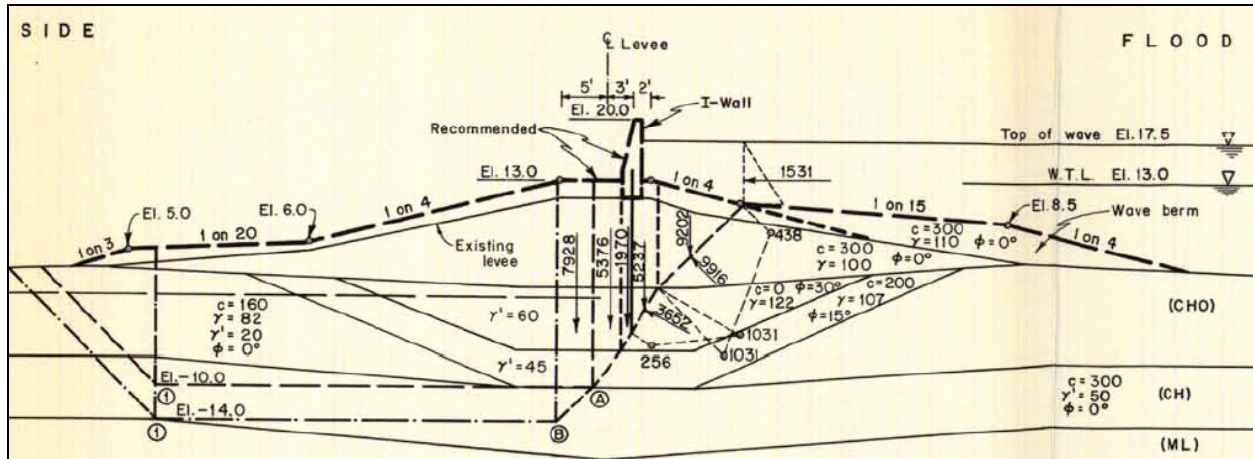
Sheet pile failure by deep wedge instability
